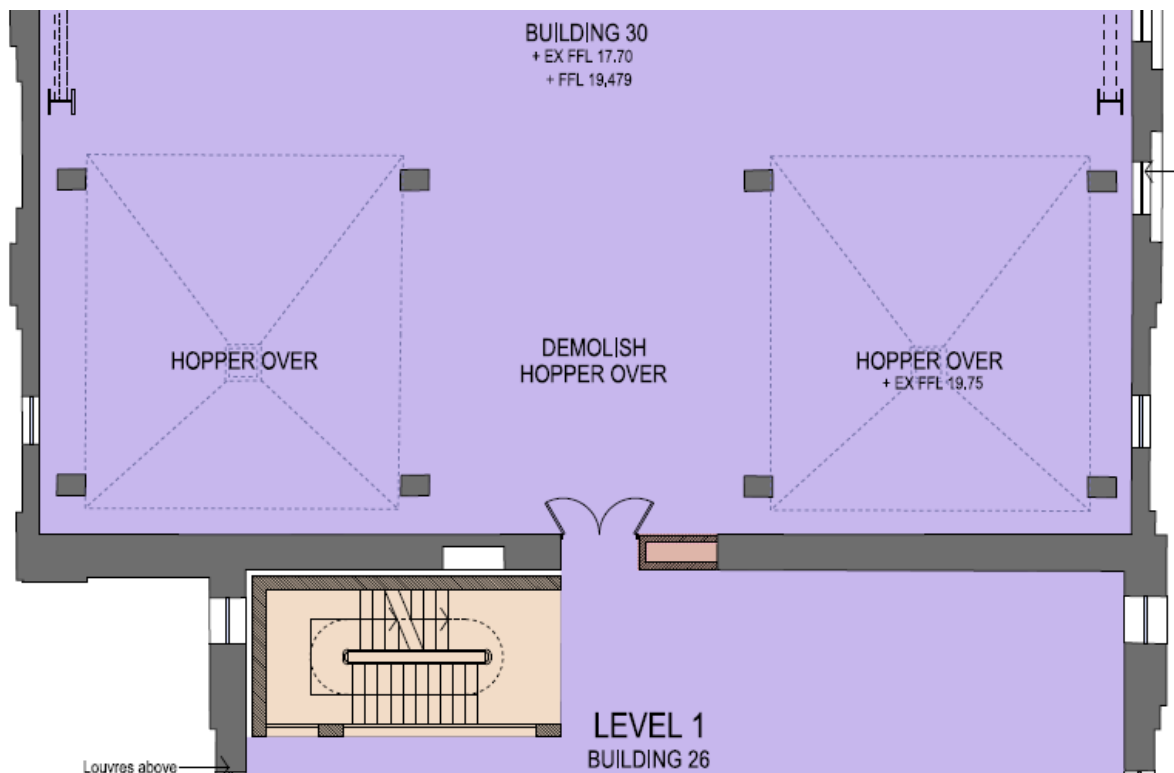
Part plan of proposed level 1 illustrating retention of two of the three hoppers.
